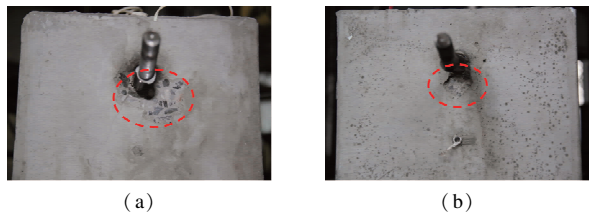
Typical failure mode for specimen. (a) D20-M-A; (b) D12-M-B
